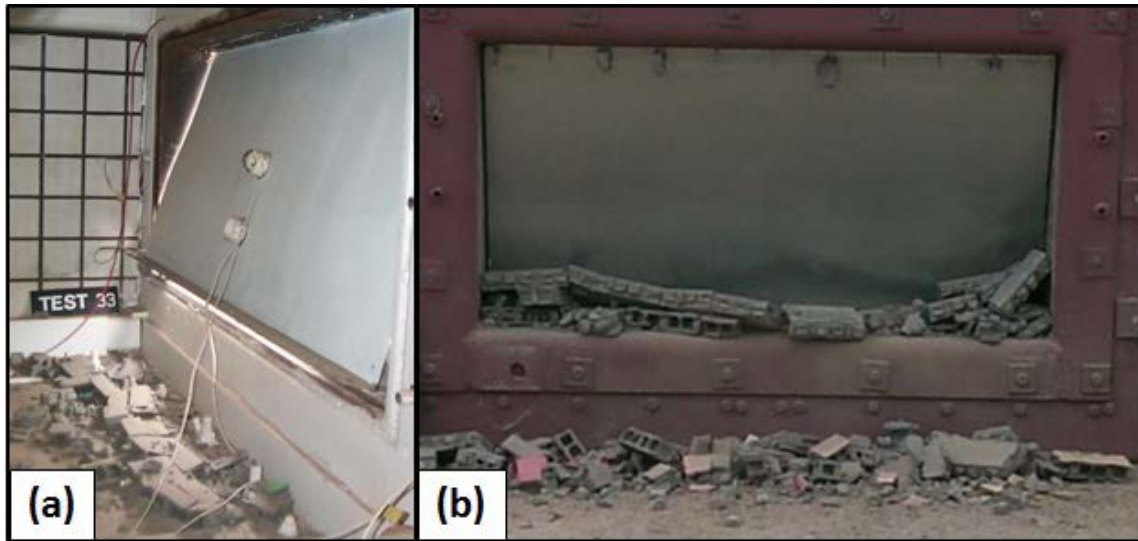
CMU wall steel sheet retrofit. (a) Pretest view of anchor plate. (b) Posttest view of anchor plate failure.
